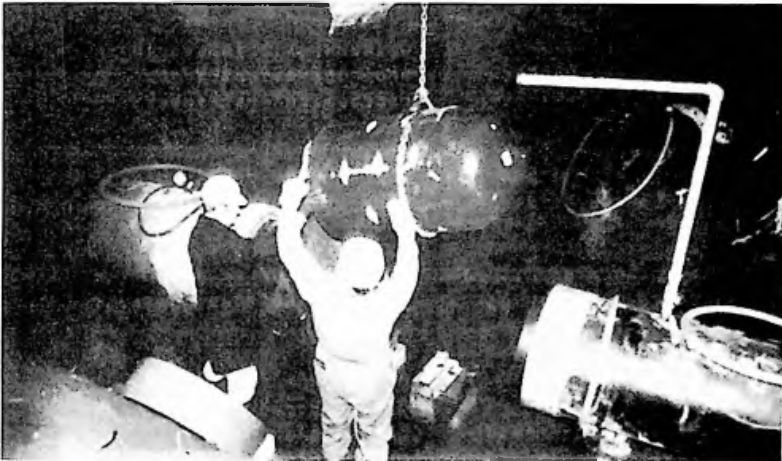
Bucket Machine Removes Loose Grit in Sewer. Courtesy Rodding-Cleaning Services, Inc.
